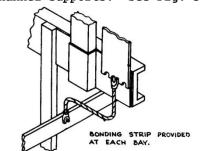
CONNECTION OF PROTECTOR STRIPS TO EARTH BAR.
